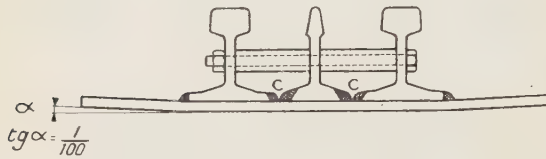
Cross section of an acute crossing welded on a bearing plate.
